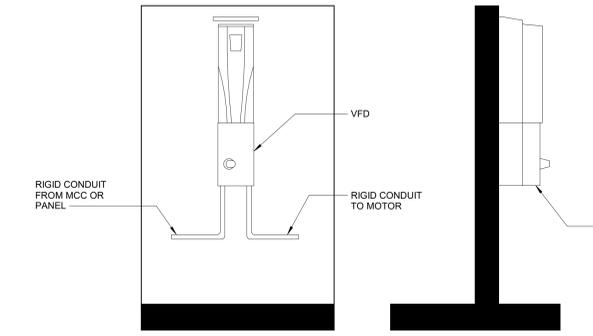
DETAIL - TYPICAL MOUNTING FOR VERTICAL CONDUIT SCALE: NONE 7
